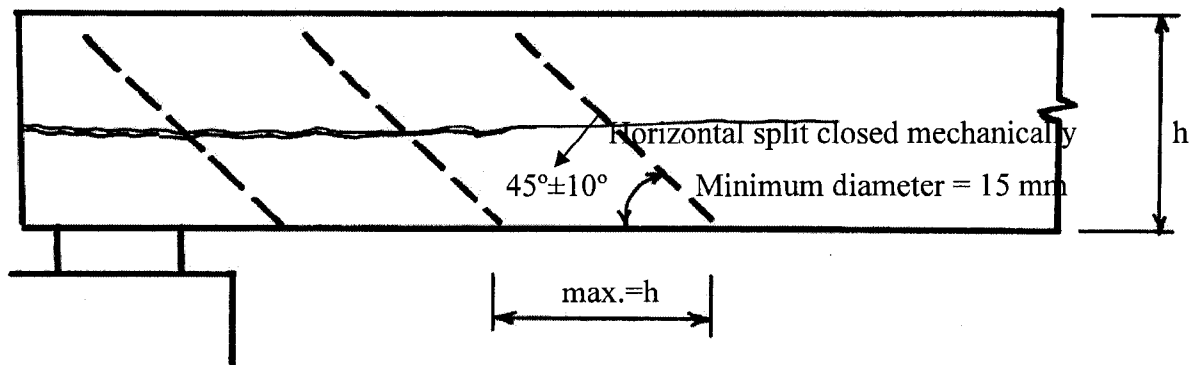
Elevation of timber beam with GFRP bars for shear strengthening, (CSA, 2006)
